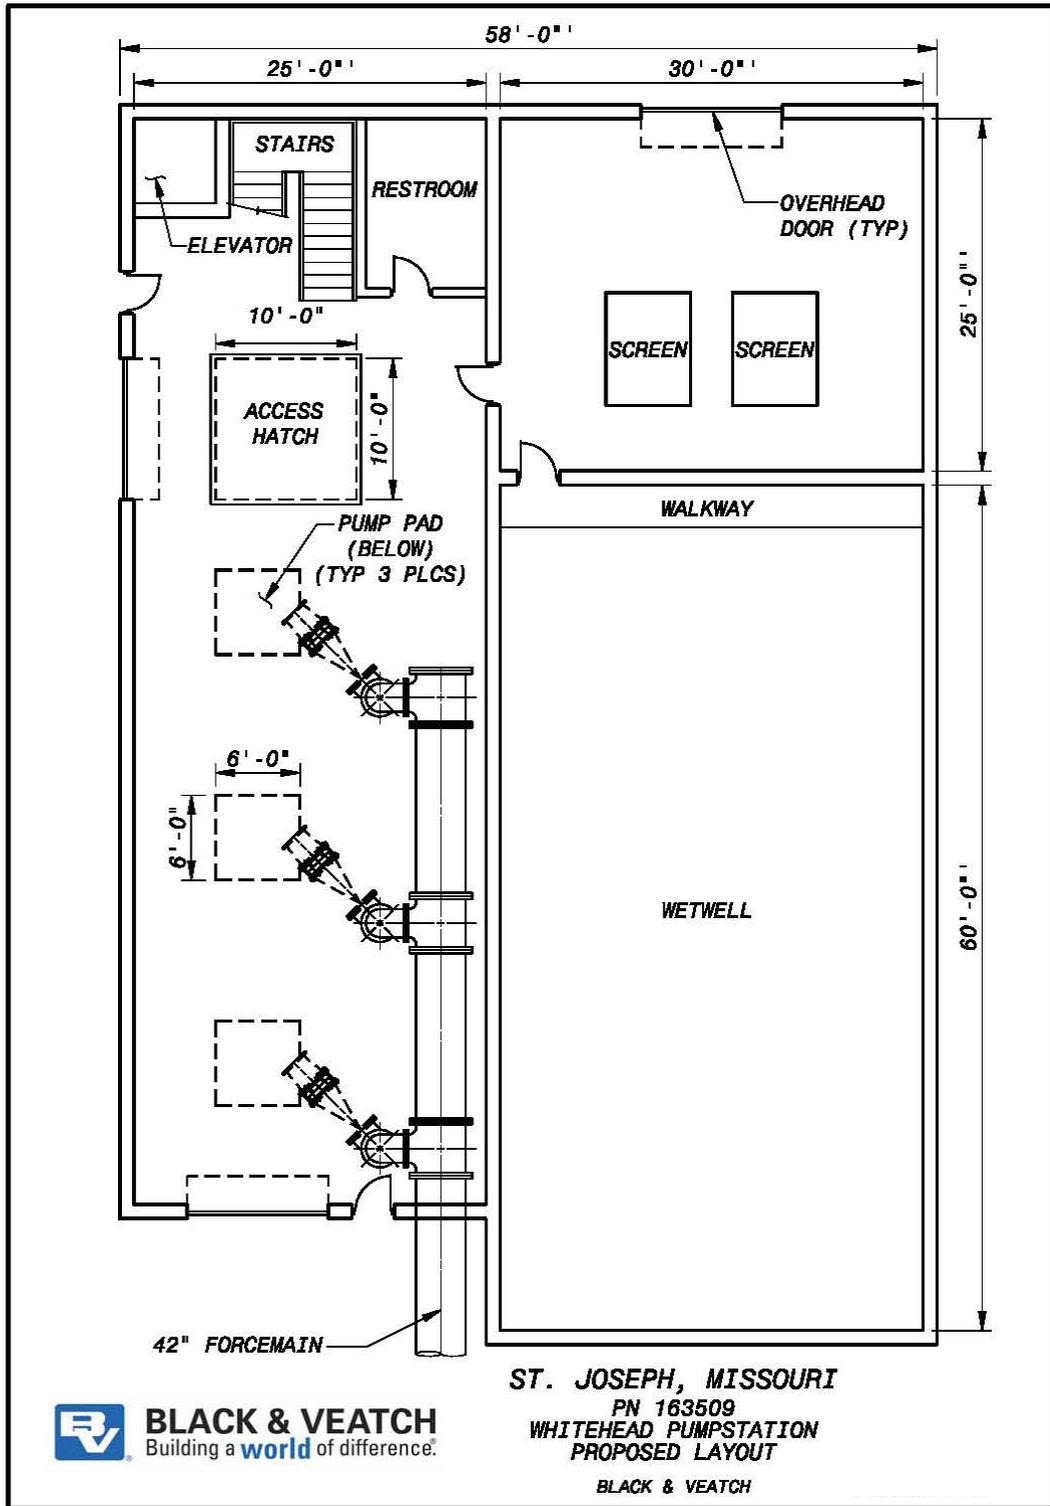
Proposed Excess Flow Pump Station Floor Plan
